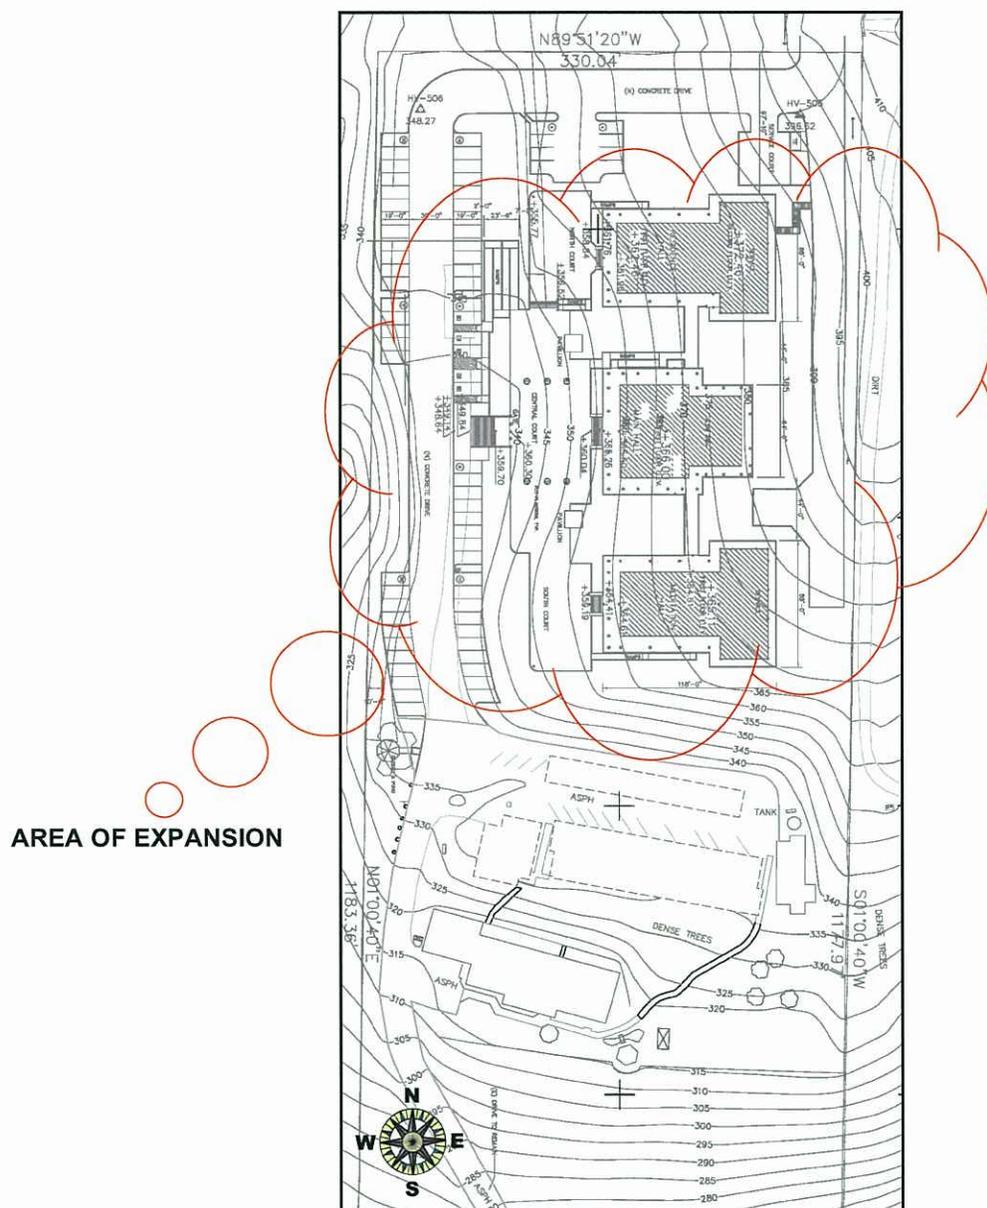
Dai Dang Meditation Center Site Plan (DLA Design Center, 8/05)
